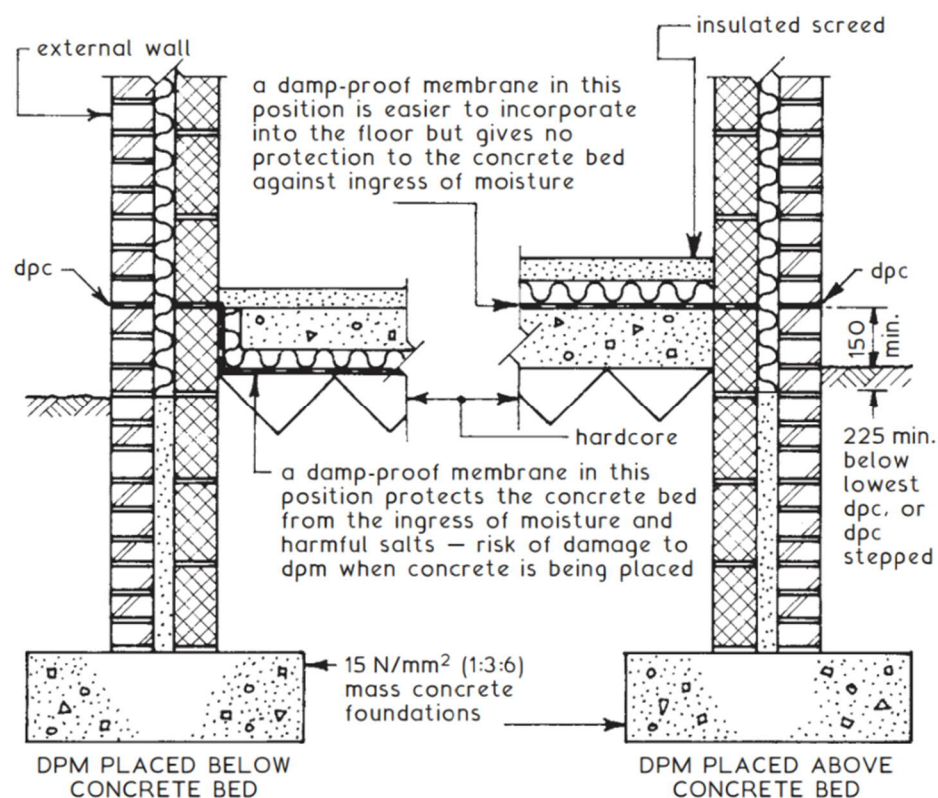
Domestic ground floors (Chudley & Greeno, 2014, p. 759)
